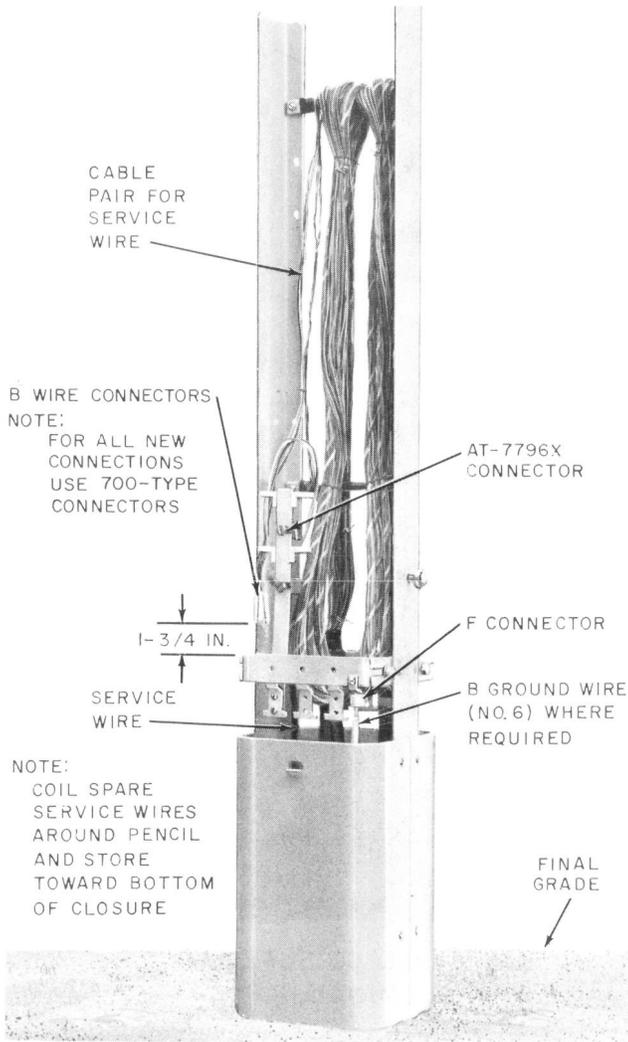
Service Wire Installed—LD-Type Cable Closure
